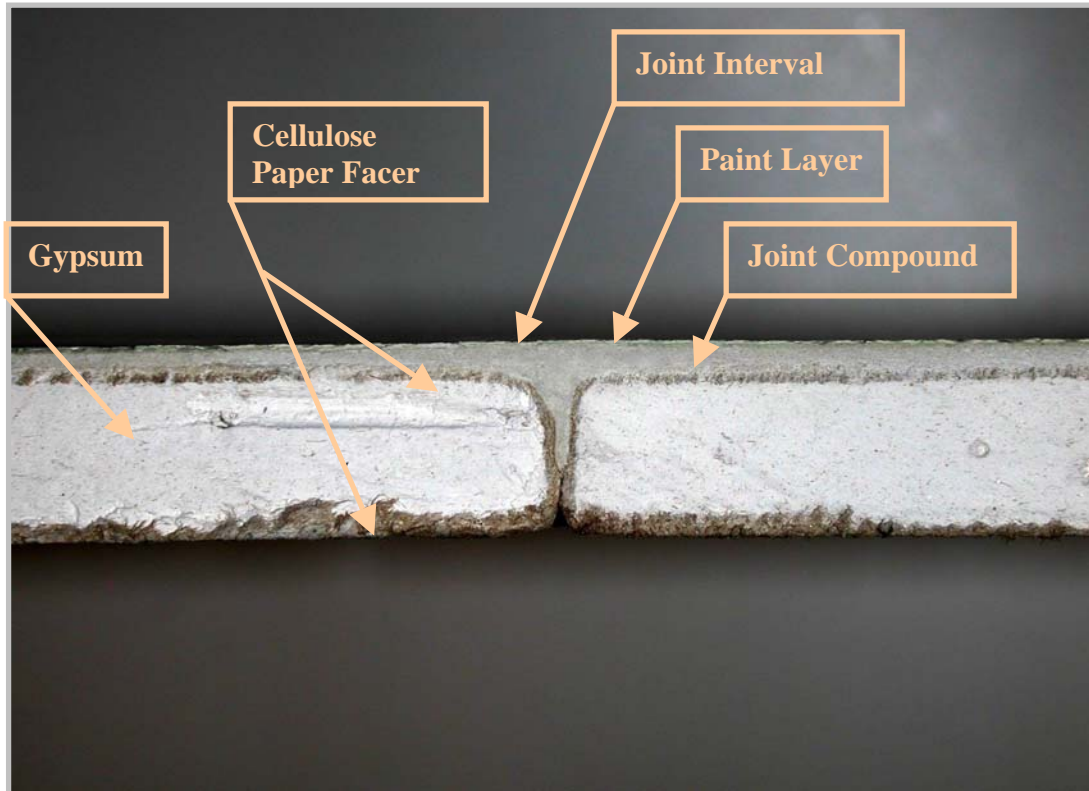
Section of 1/2-inch gypsum wallboard showing a multi-layered joint interval. Wallboard was obtained from Building #3607.
